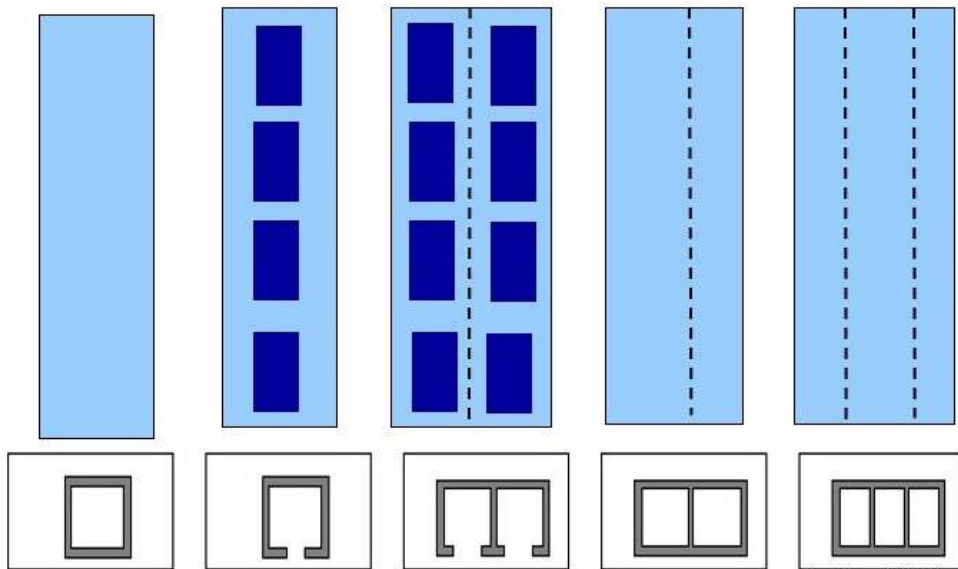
Basic types of shear walls in plan and elevation (Anwar 2009)
